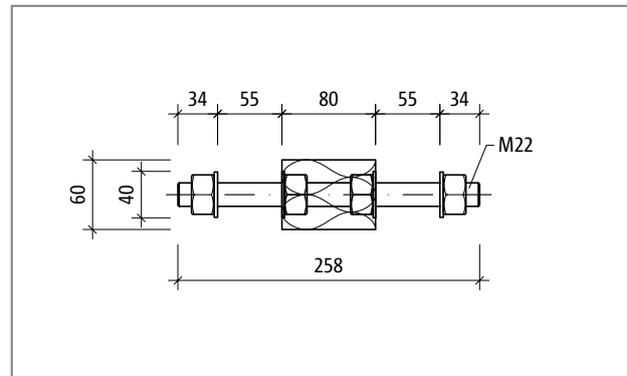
Schöck Isokorb® T type S-N-D22: Cross-section
